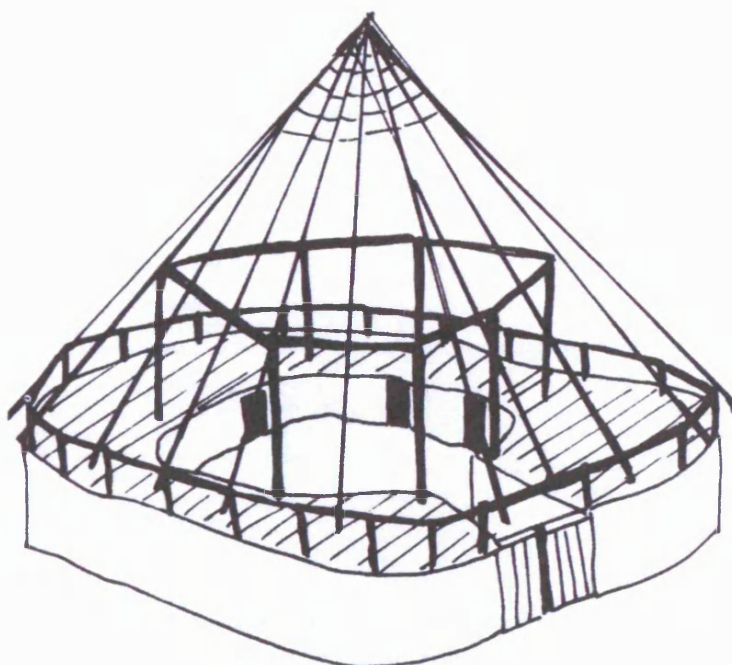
Reconstruction of a courtyard house under a single roof (after Wood 1997: 104).
